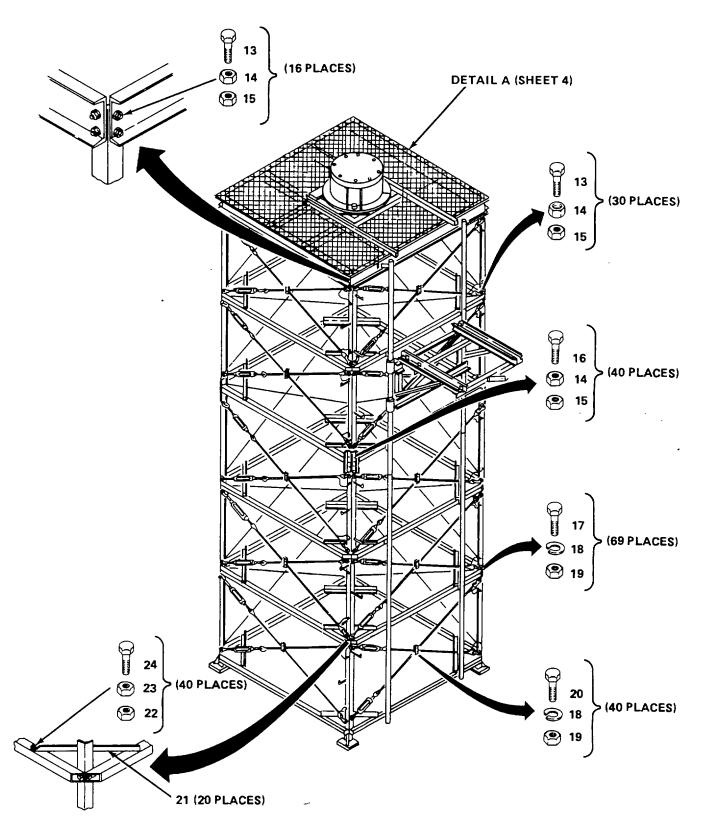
Tower Assembly Kit (Sheet 2 of 6)
